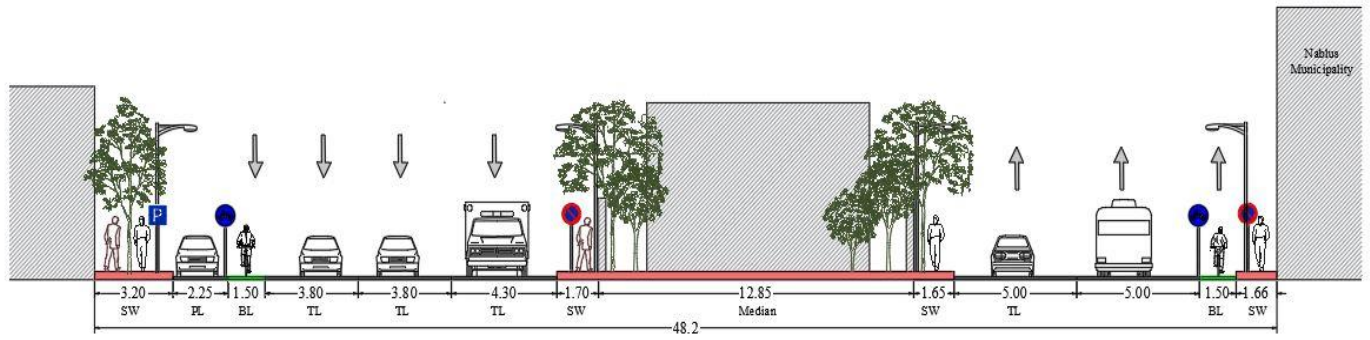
17: Cross Section F-F, Al-Malek Faisal Street
